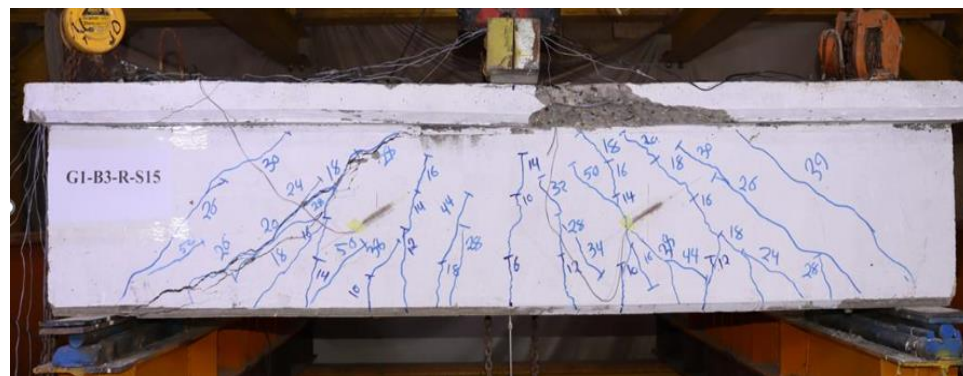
Failure crack pattern of specimen G1-B3-R-S15
